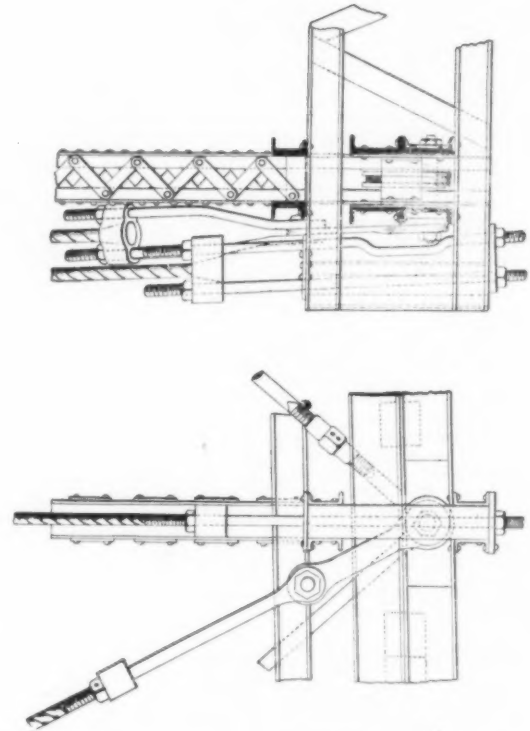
FAULTY ADJUSTMENT OF STIRRUPS.
